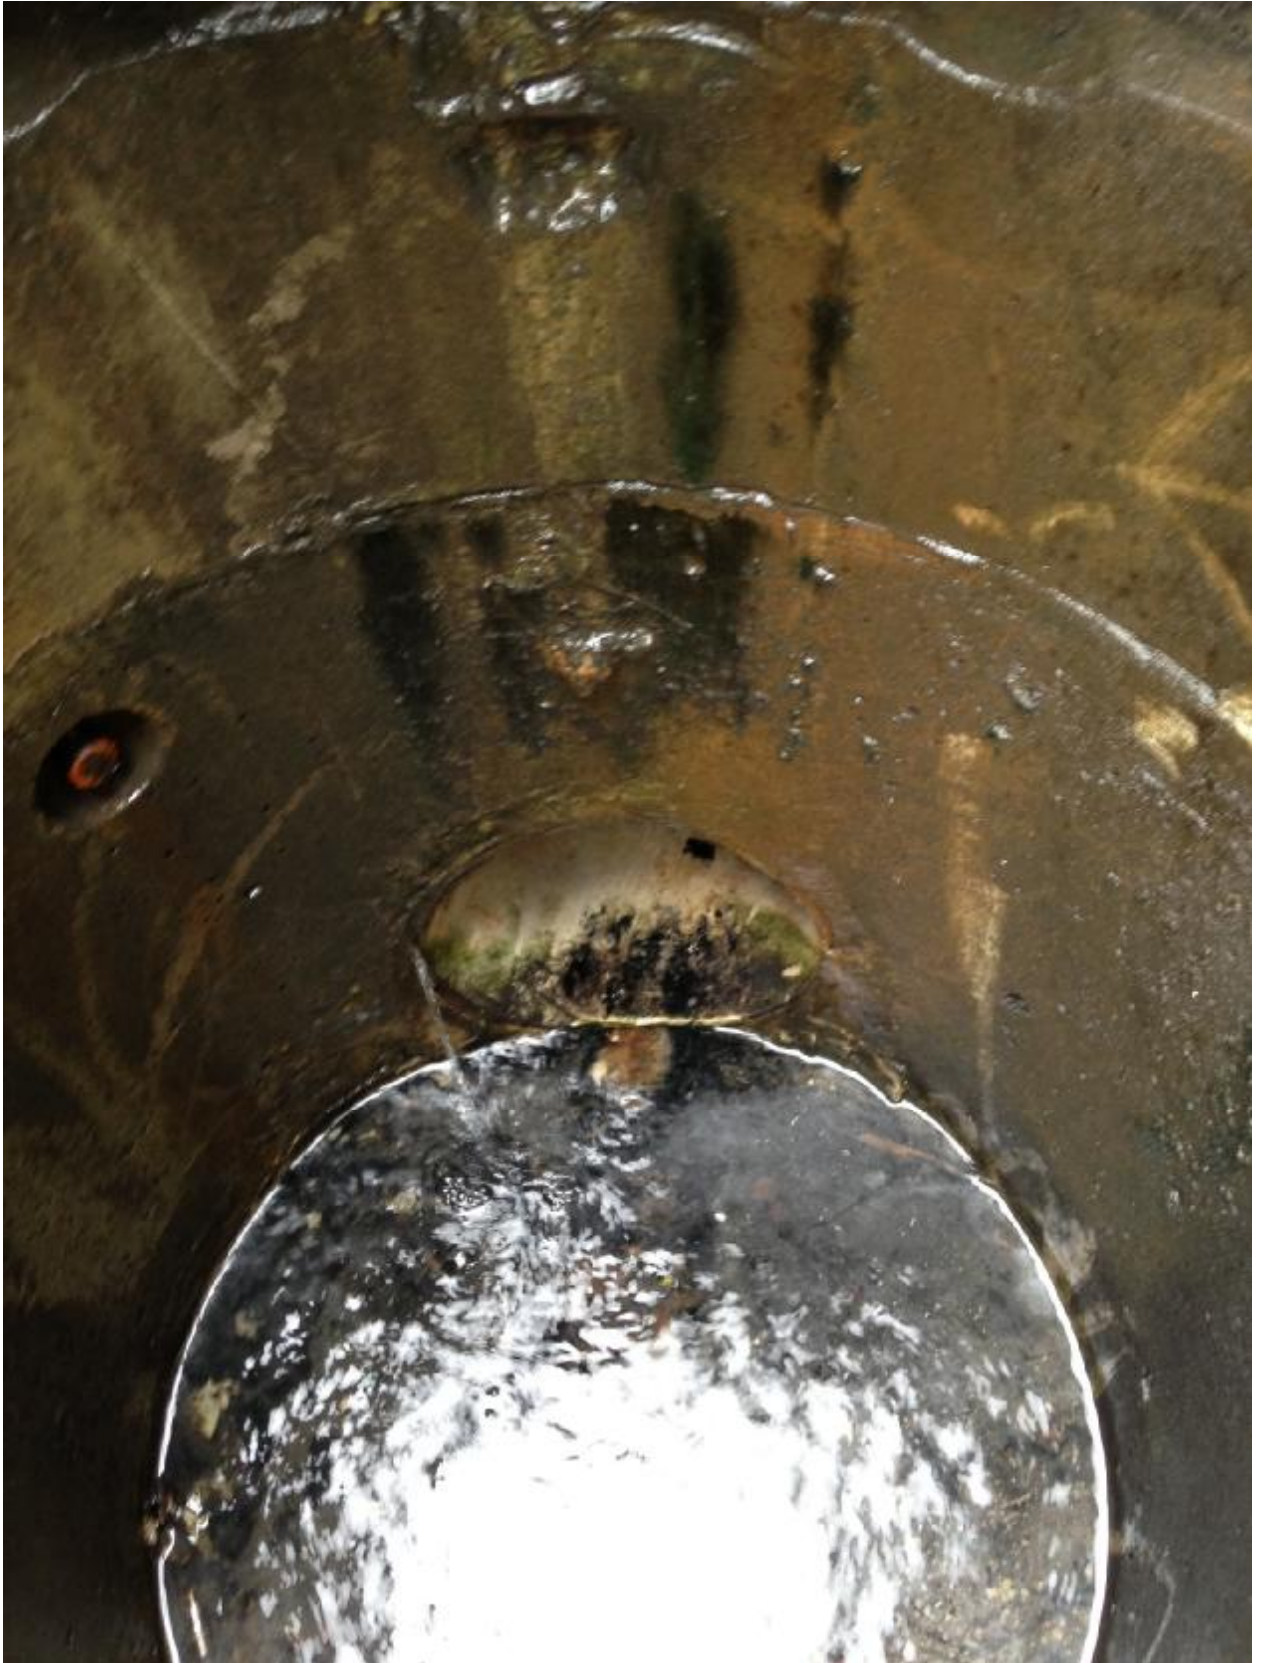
Ground water entering around pipe penetration in basement drainage manhole located in loading dock
